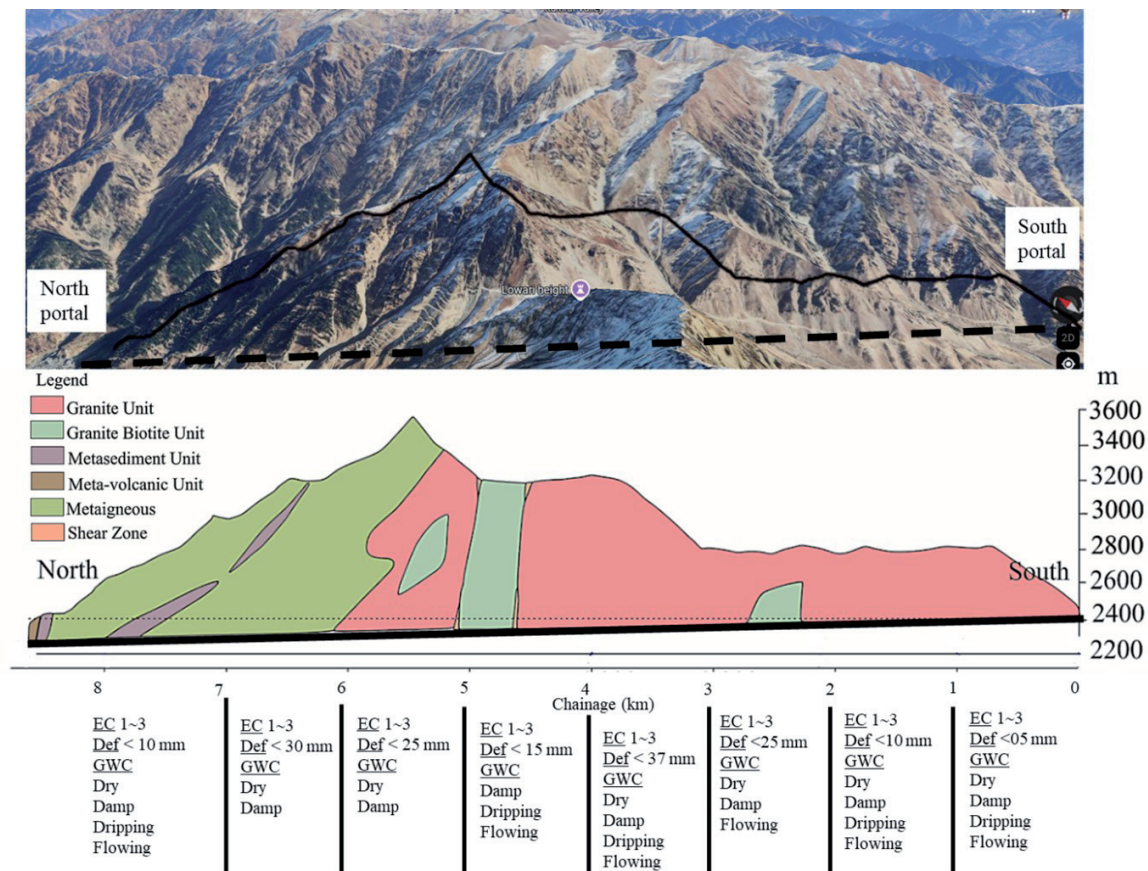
Aerial view and geological cross-section of the Lowari Tunnel alignment, showing lithological units, shear zones, excavation classes (EC), deformation (Def.), and groundwater conditions (GWC). The dashed line indicates the tunnel axis profile. (KHAN *et alii*, 2022)
